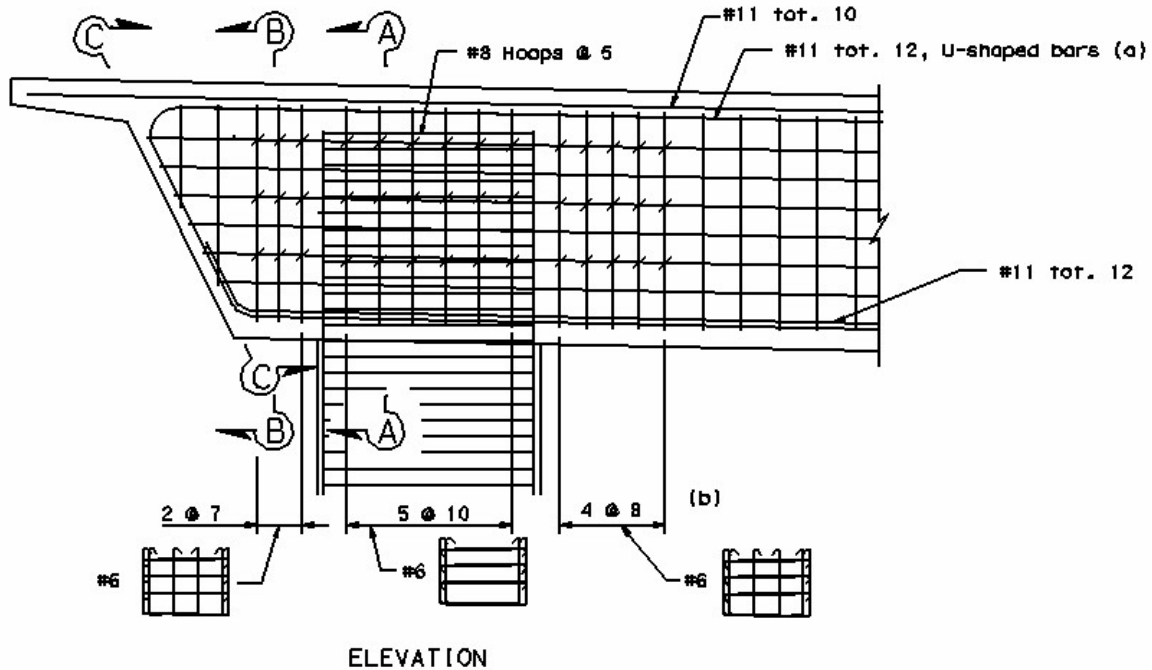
Location of Joint Shear Reinforcement (Elevation View)
